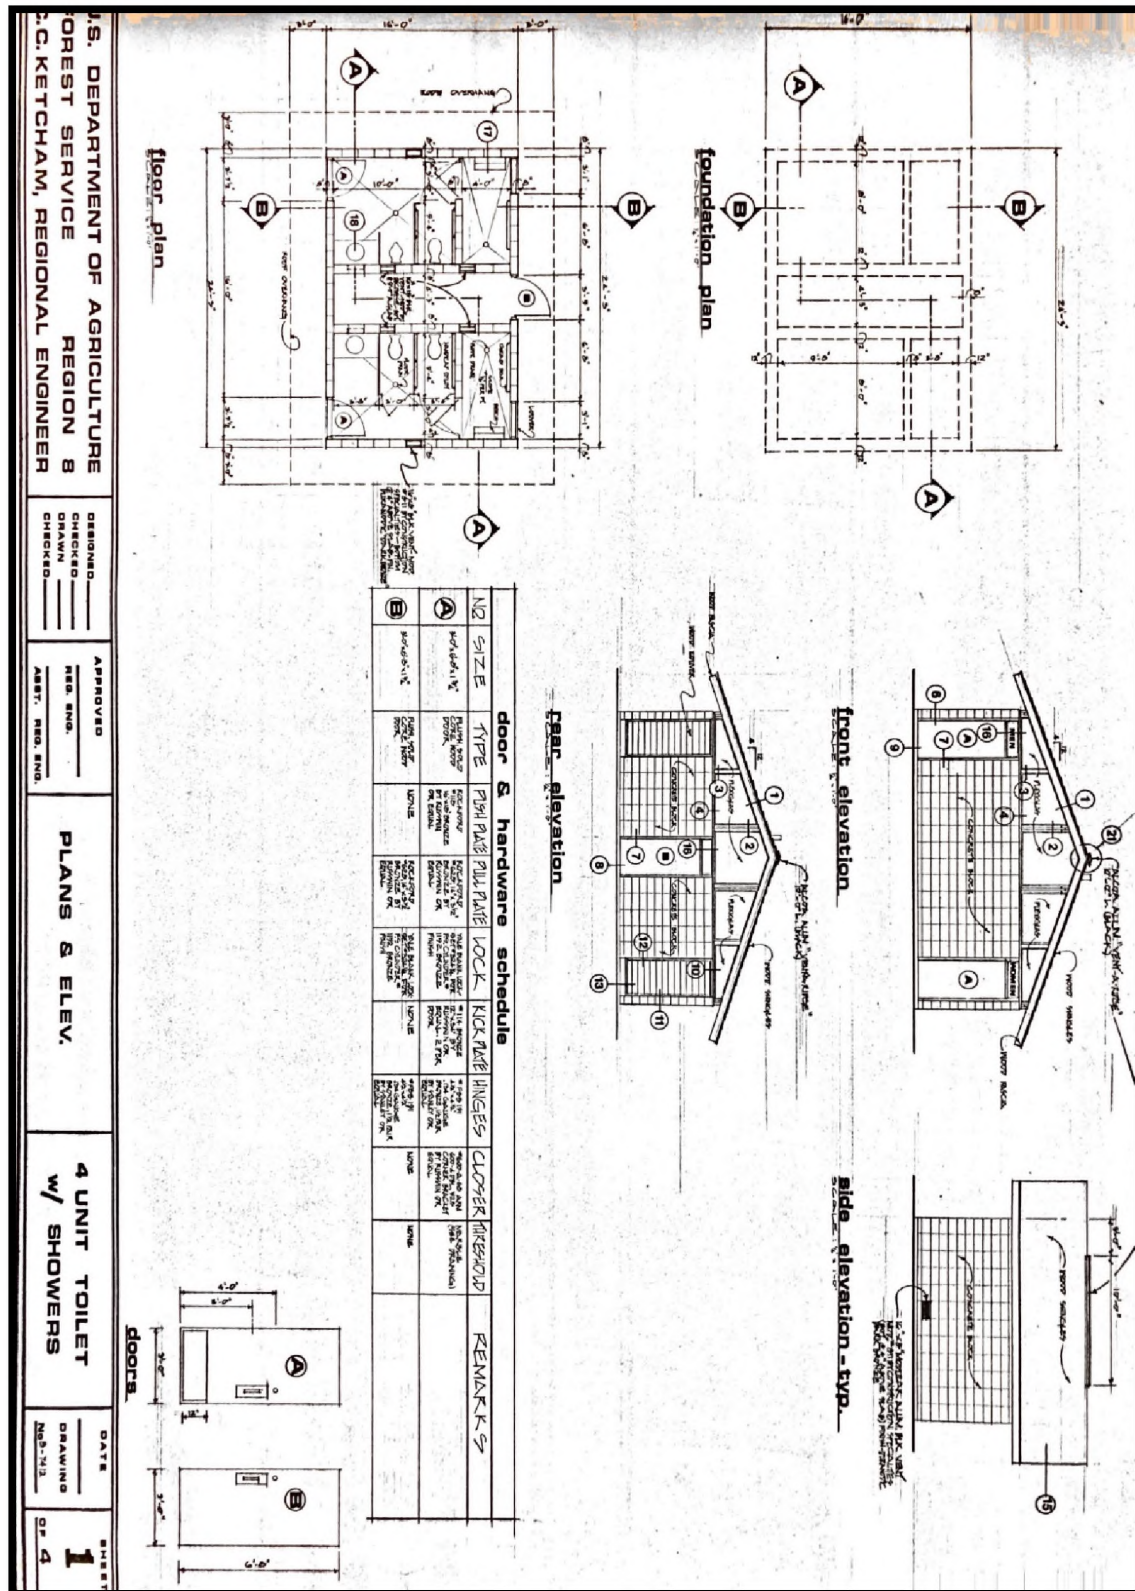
Architectural Plans of Parsons Mountain Restroom and Bath House, US Forest Service standard recreational building design B-7412.
